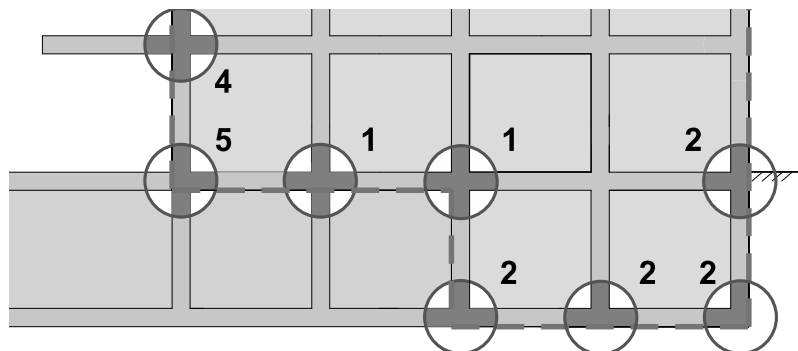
Cross-section of basement and ground floor showing locations of thermal bridge types
